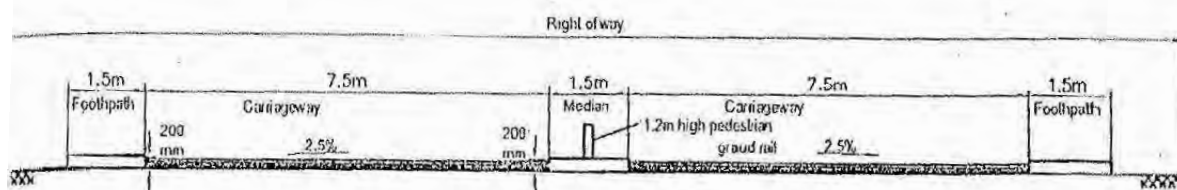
TCS 2.2 4-Lane divided Carriageway with Footpath (Built-up area)
